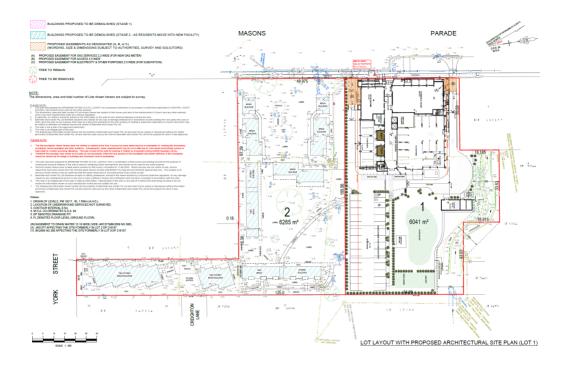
| Proposed Subdivision Plan (Source: Applicant's documentation)
